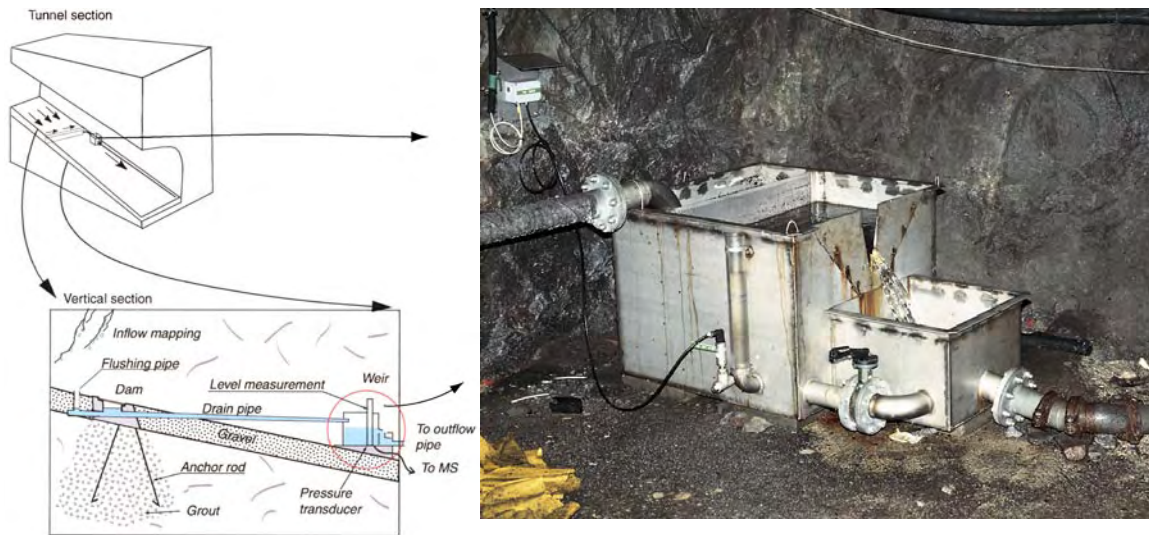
The system for measuring water inflow to a section of the tunnel. Illustration of construction the ditch and dam across the tunnel floor and v-notch weir for flow measurement.
